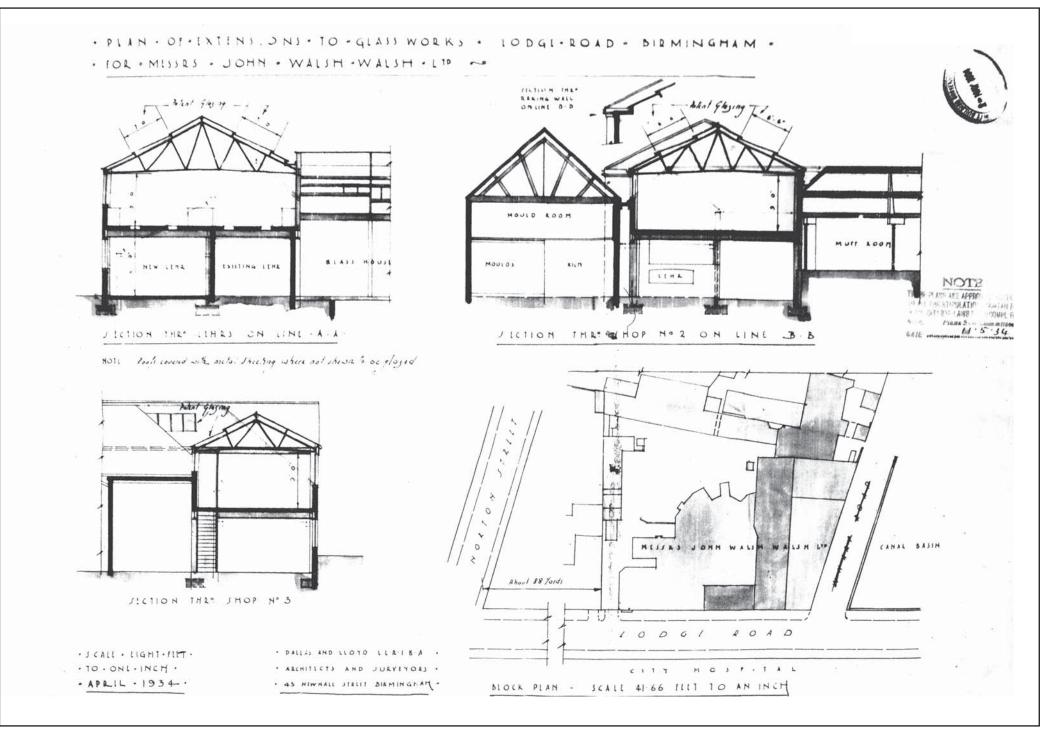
Design Drawings for Building D: Block Plans and Sections April 1934
